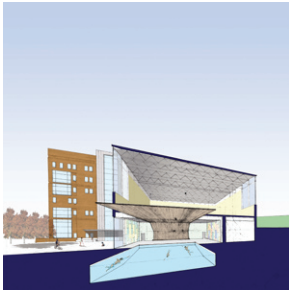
Final Drawings - Section Perspectives, Sections, and Elevations
